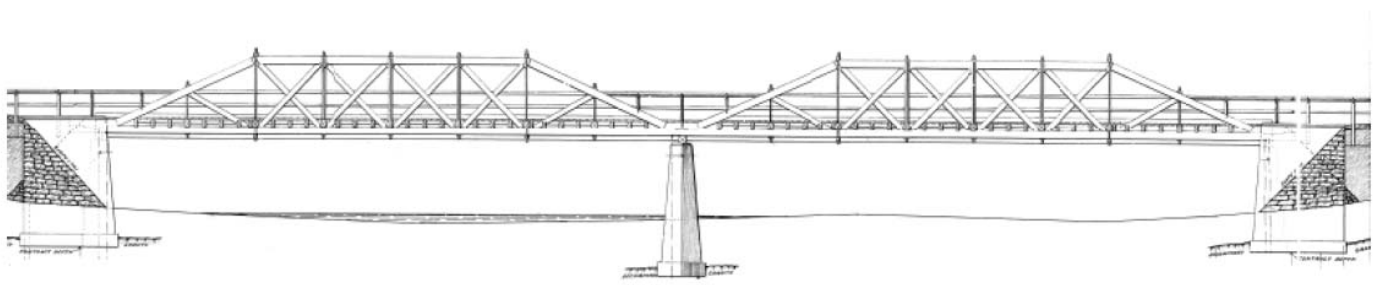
McKanes Bridge side profile showing bridge spans as existing
